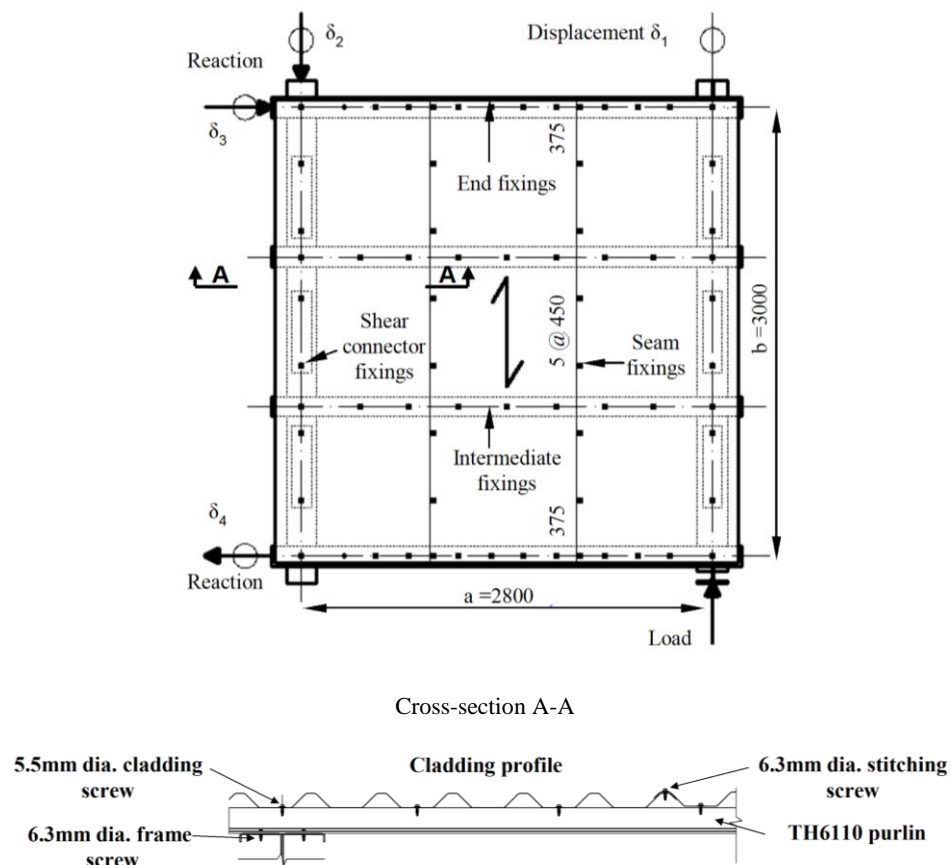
Test arrangement for single skin diaphragm fixed on 4 sides
